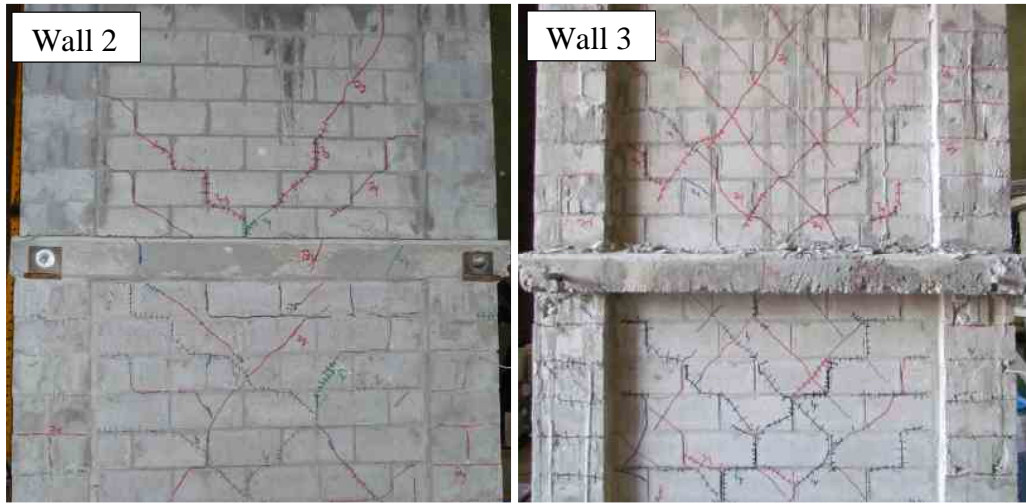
Photos of Shear Crack Penetration in Walls 2 and 3
